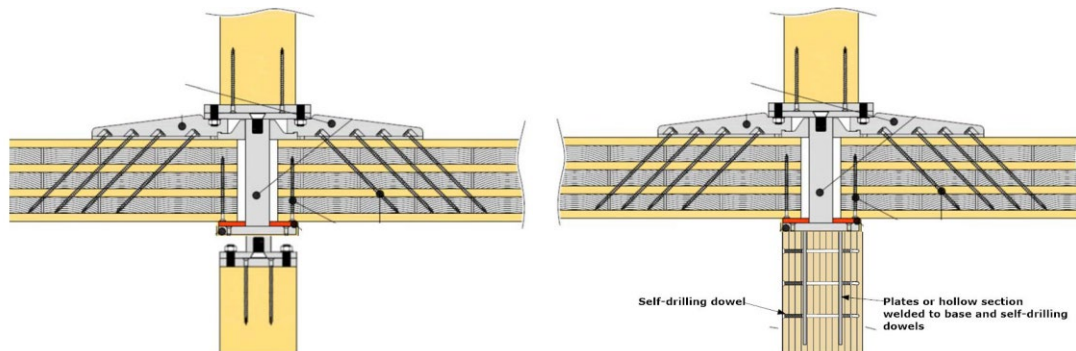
Concepts to fix Spider Connection to Lower Storey Column
